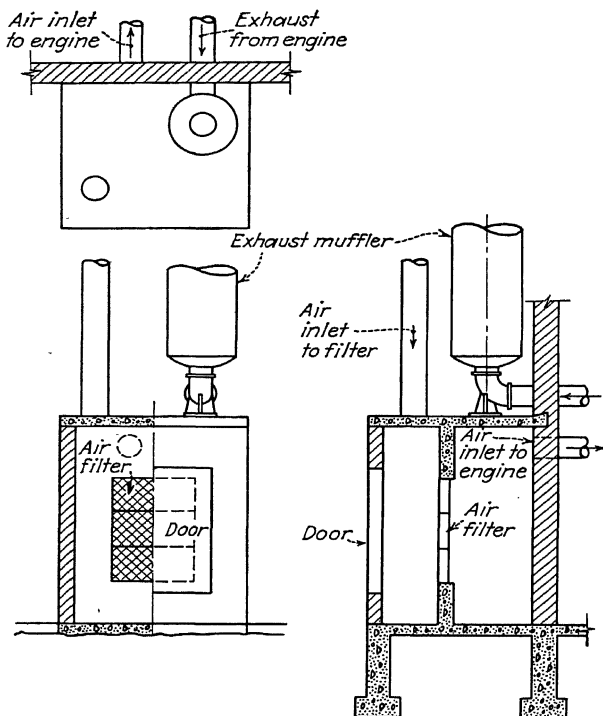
Combined air-filter housing and support for exhaust muffler.
